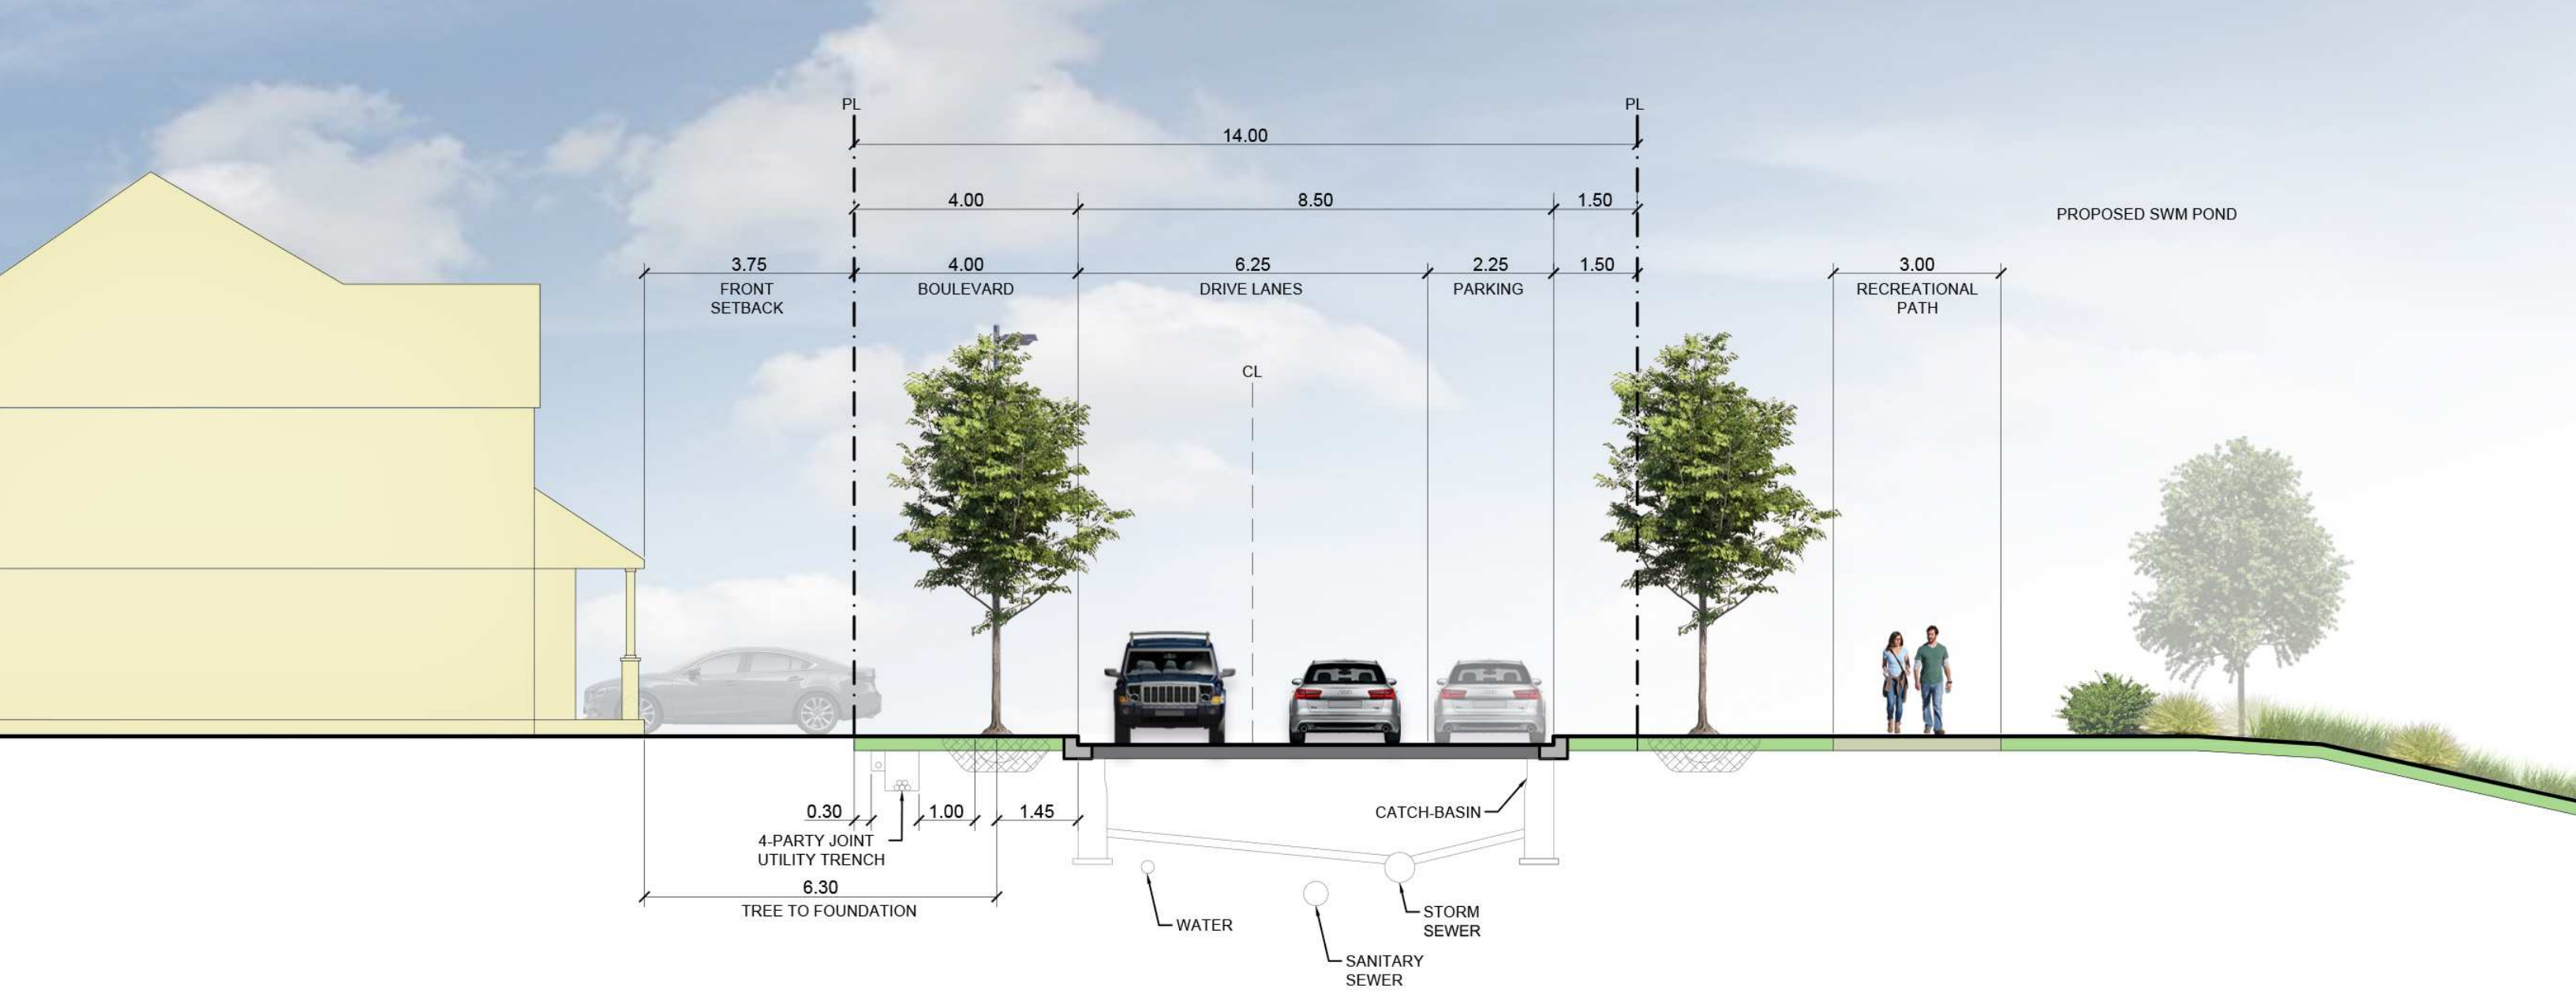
Window Street (Typical 14.0m Right-of-Way) Cross Section
